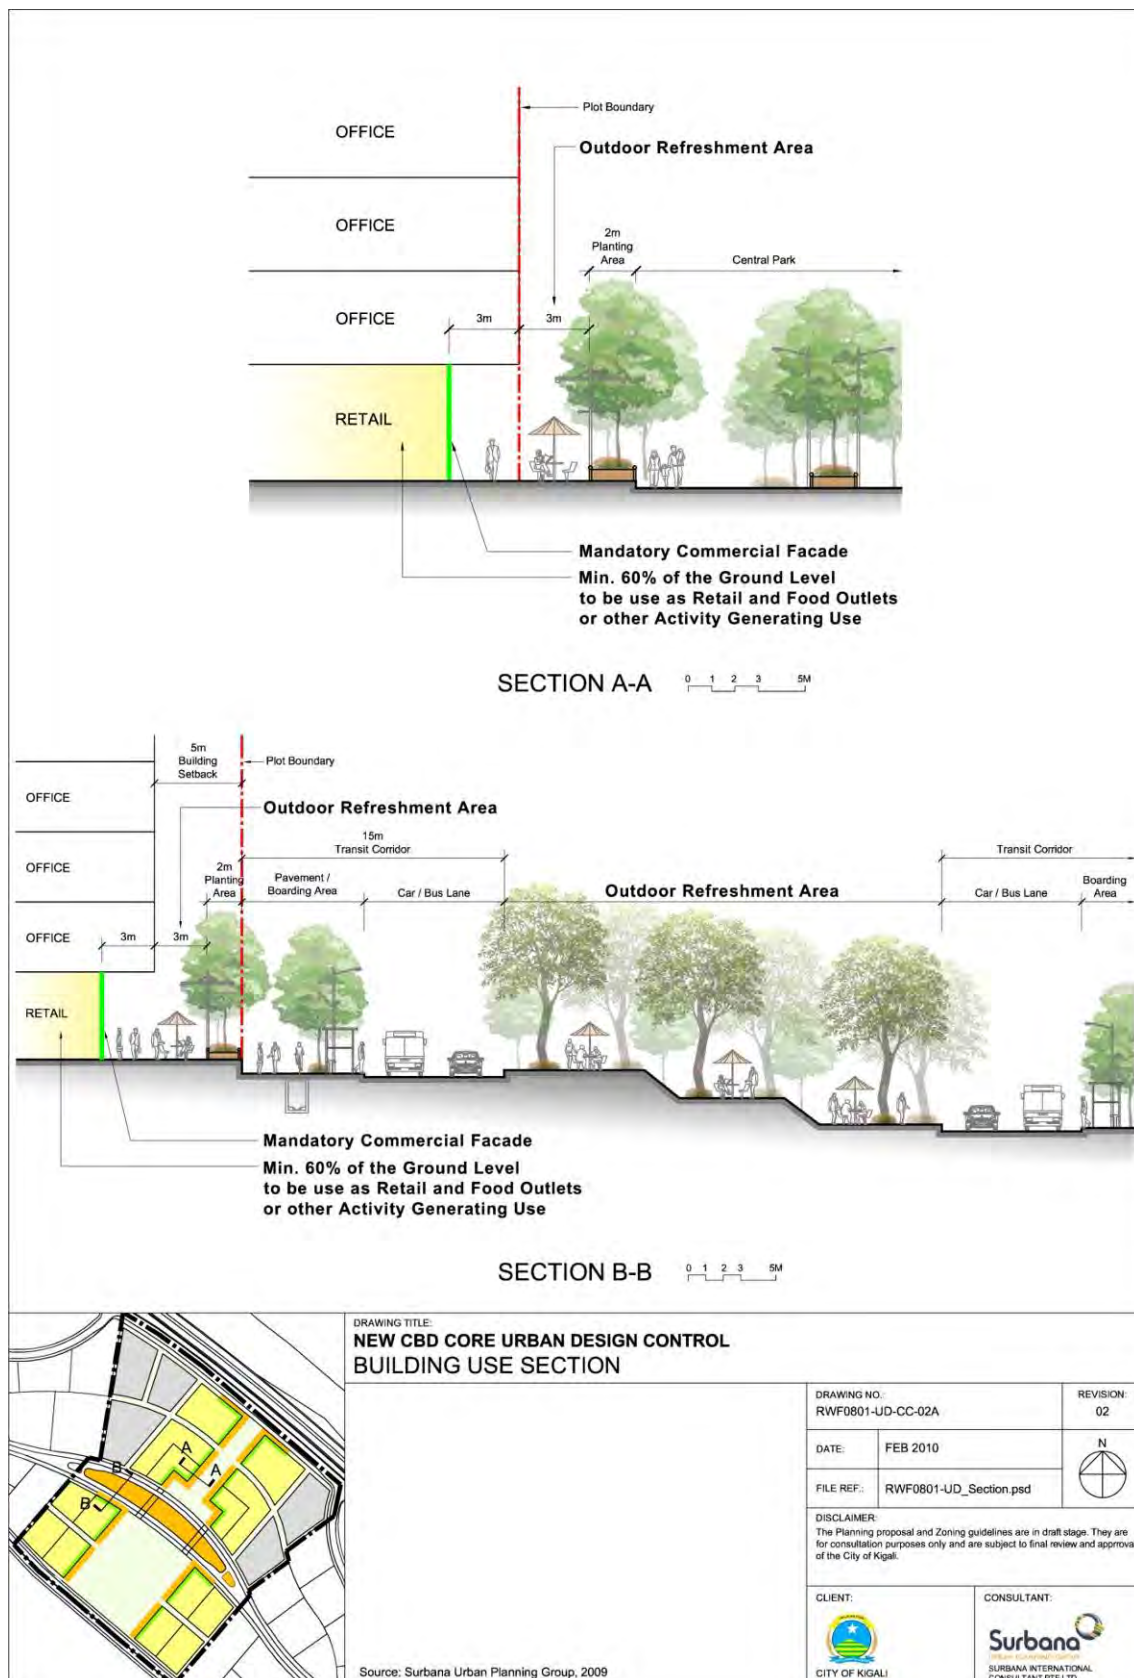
New CBD Core Urban Design Control Building Use Section.
